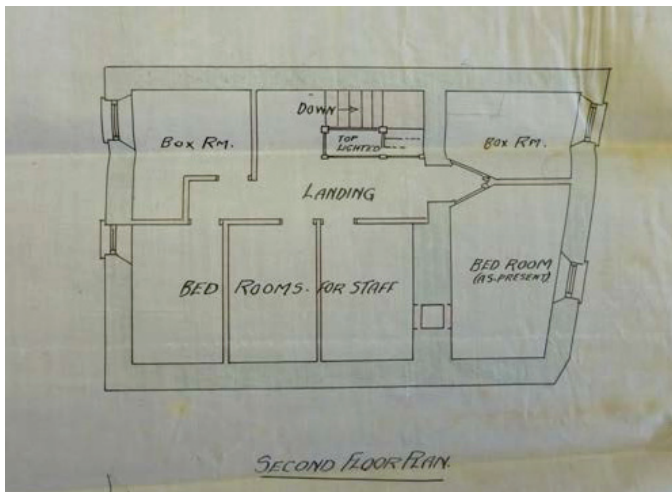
(left): Proposed second floor plan (CAC(B) BSRDNL/2/583 1909)
